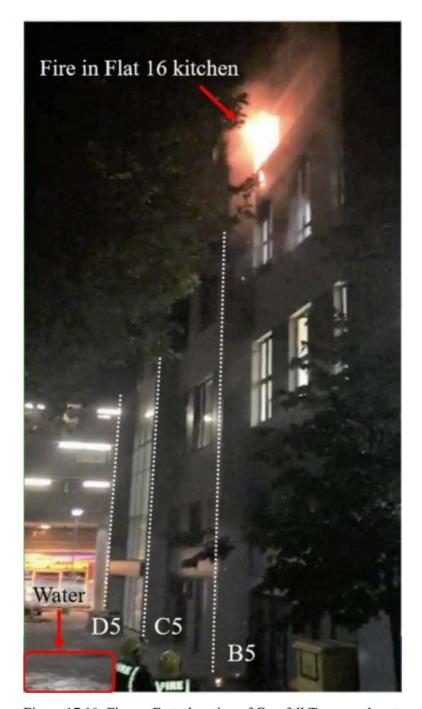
Fire on East elevation of Grenfell Tower and water on ground at 01:11.
